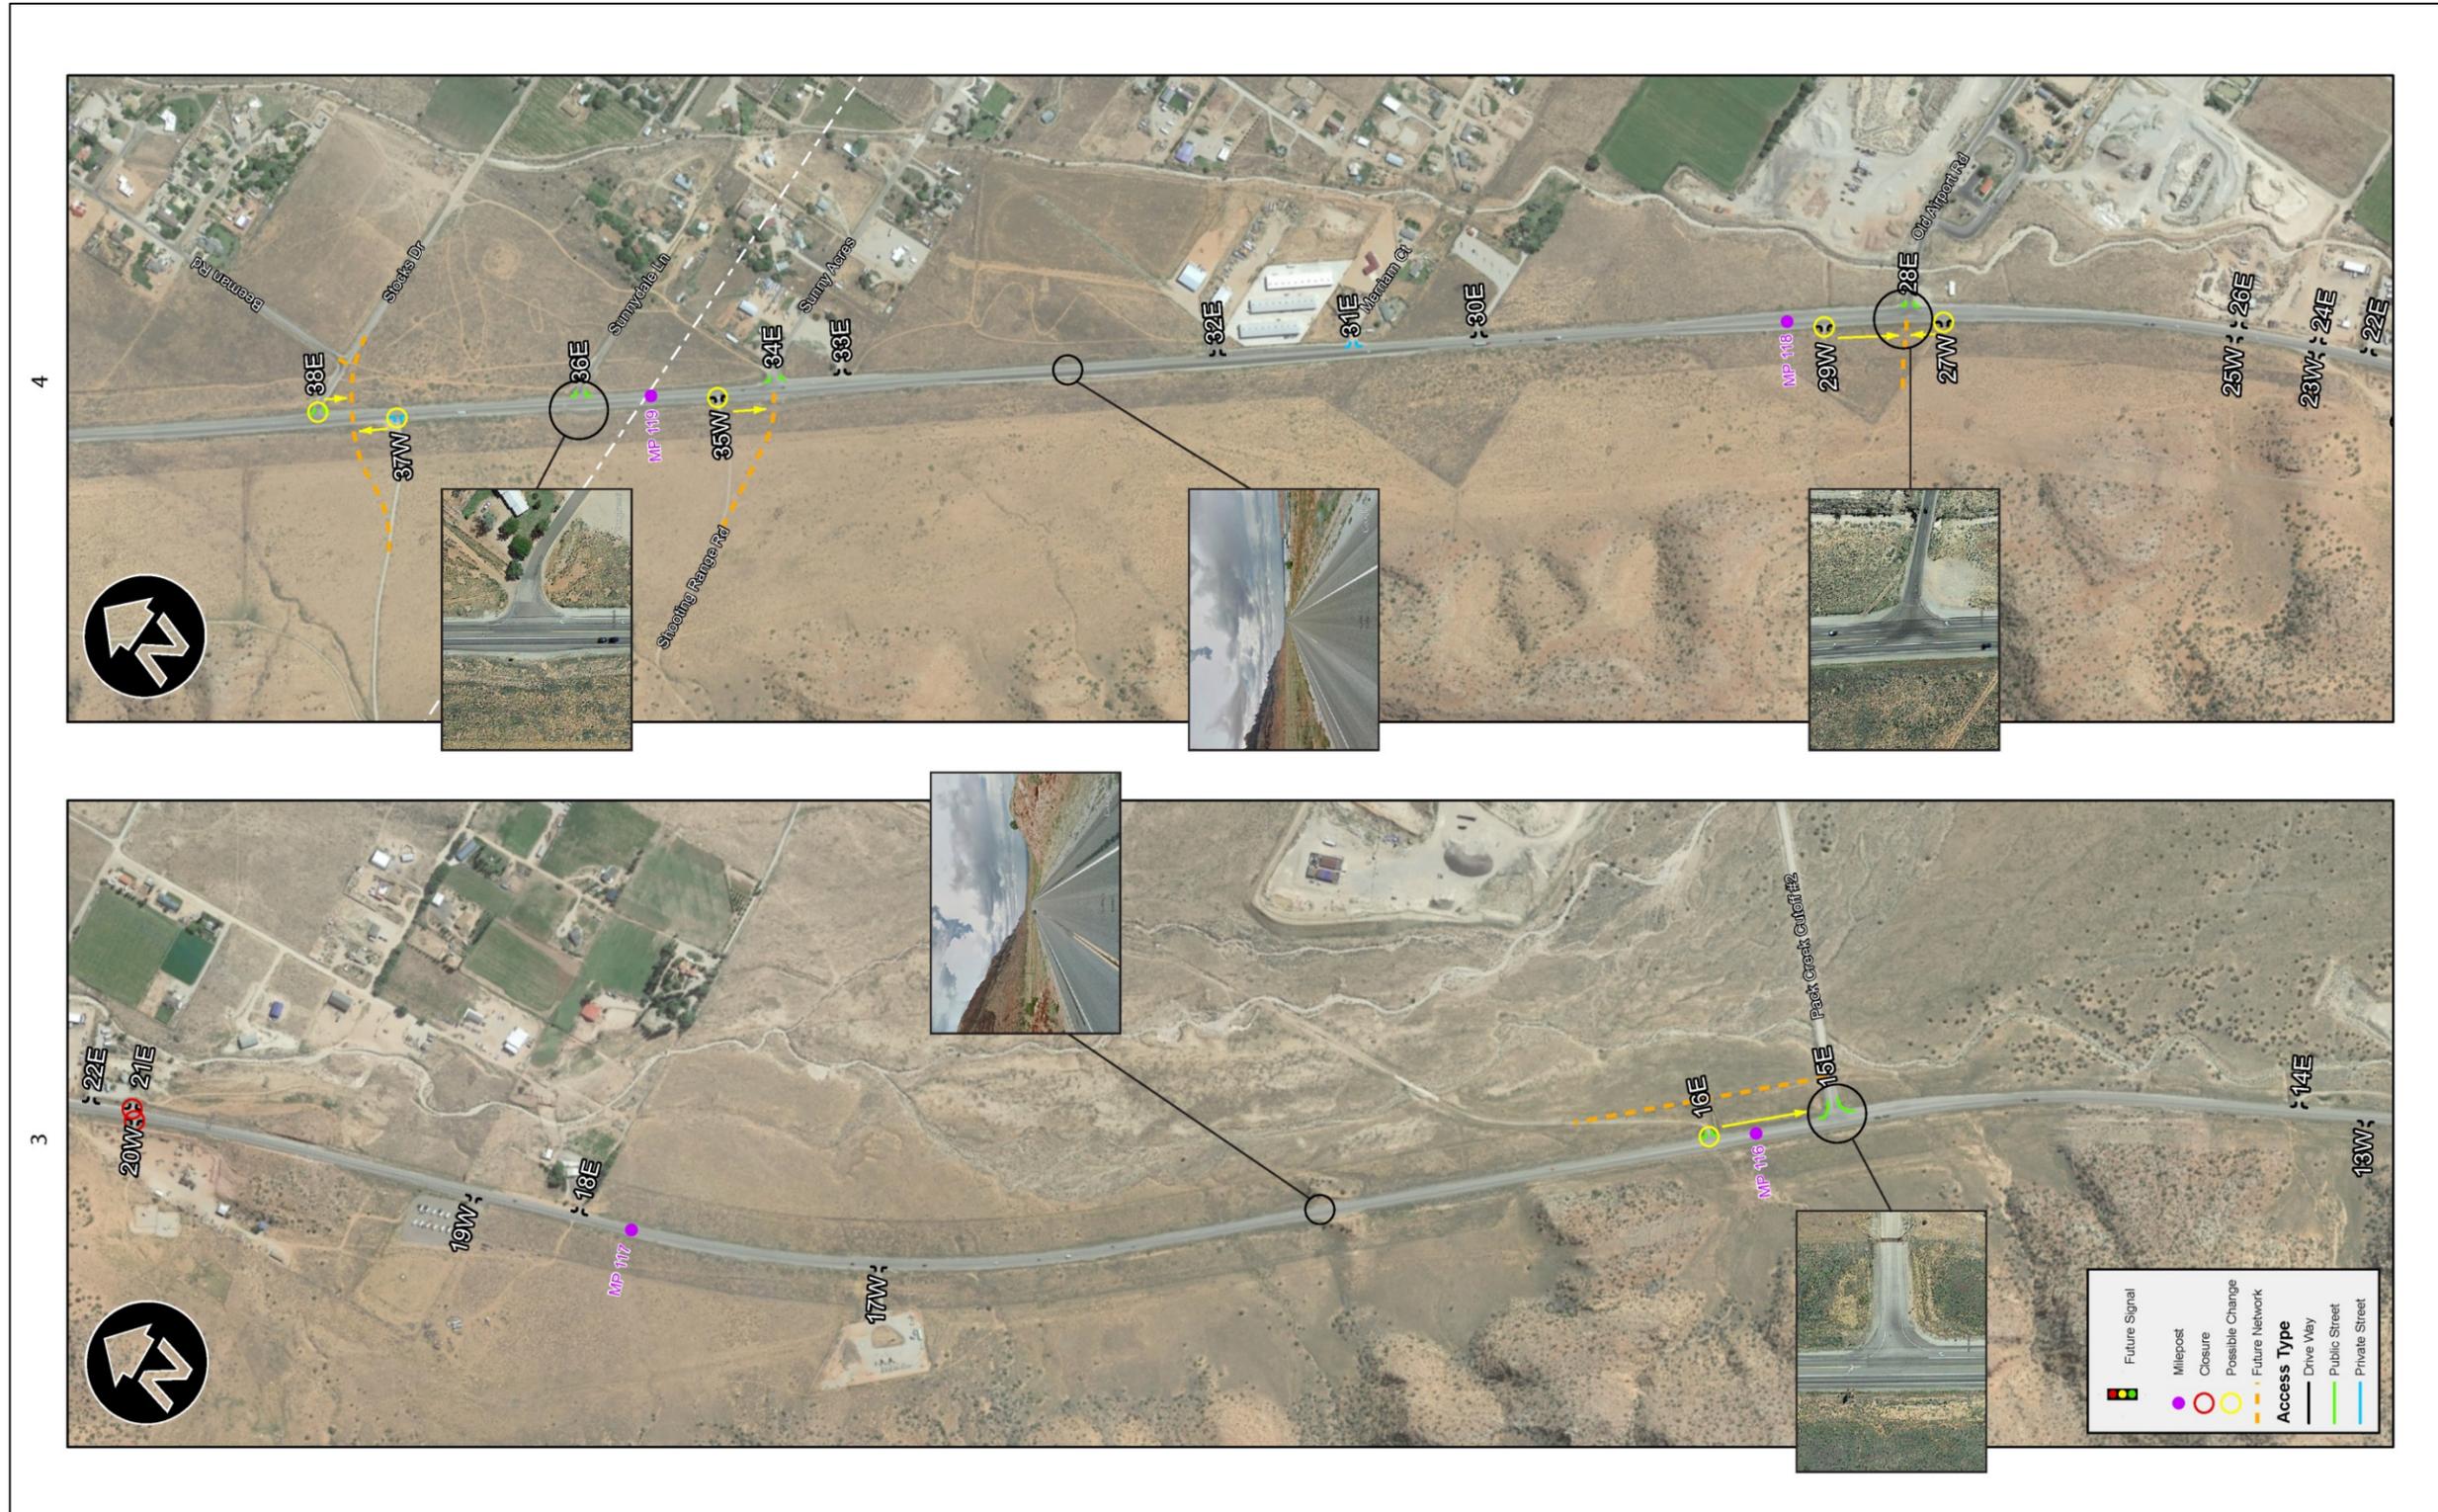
Exhibit A: Sheets 1-6, Signal Control Plan and Access Corridor Control Plan
